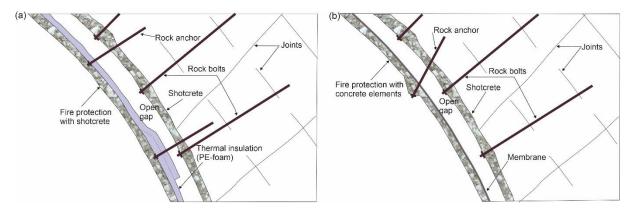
Details of water shielding and frost insulation arrangement in Norway. a) Water shielding arrangements with shotcrete and PE-foam; b) Water shielding arrangements with concrete elements and waterproof membrane.
